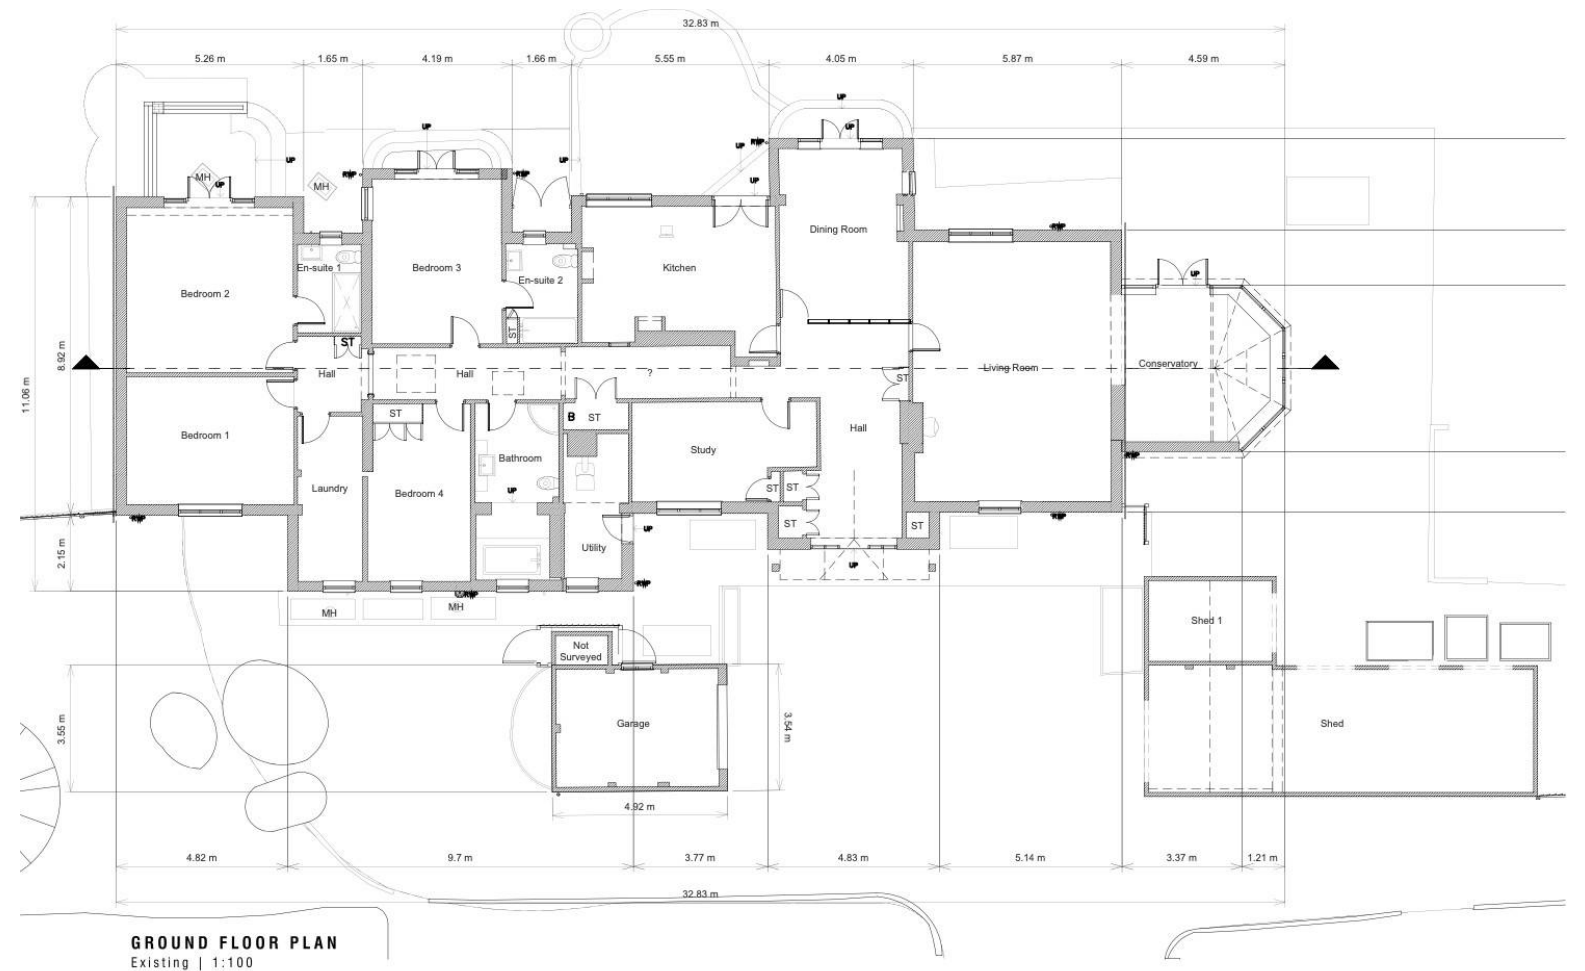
DRAWING 2410 101 EXISTING PLANS (EXTRACT)
